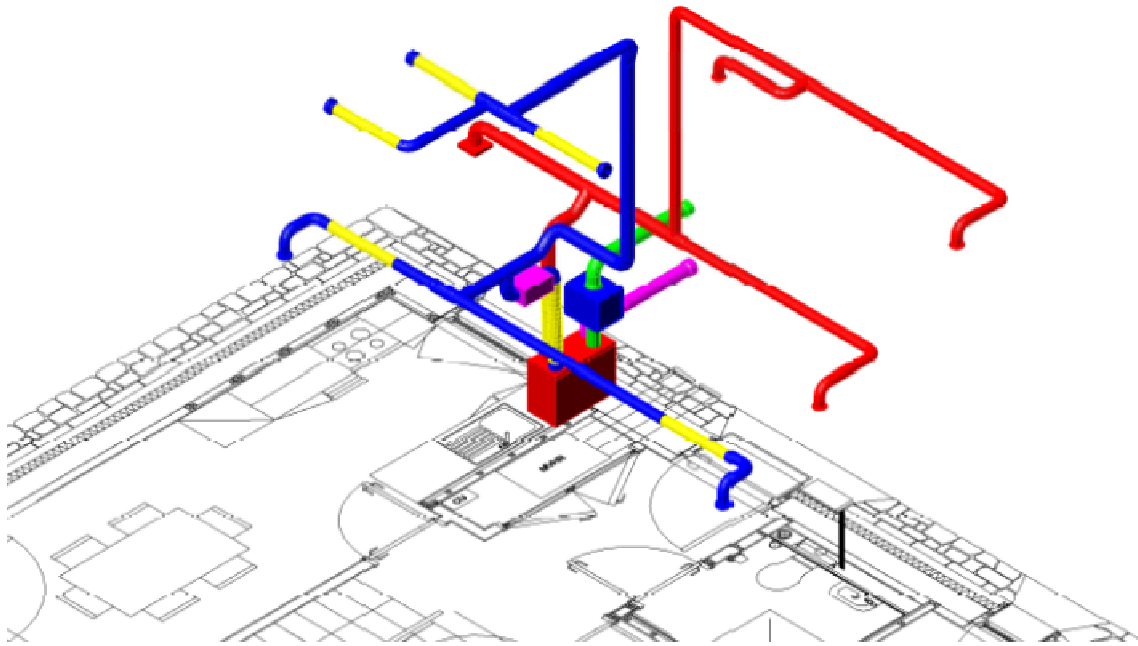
Heat recovery ventilation diagram designed by Green Building Store for Larch House
